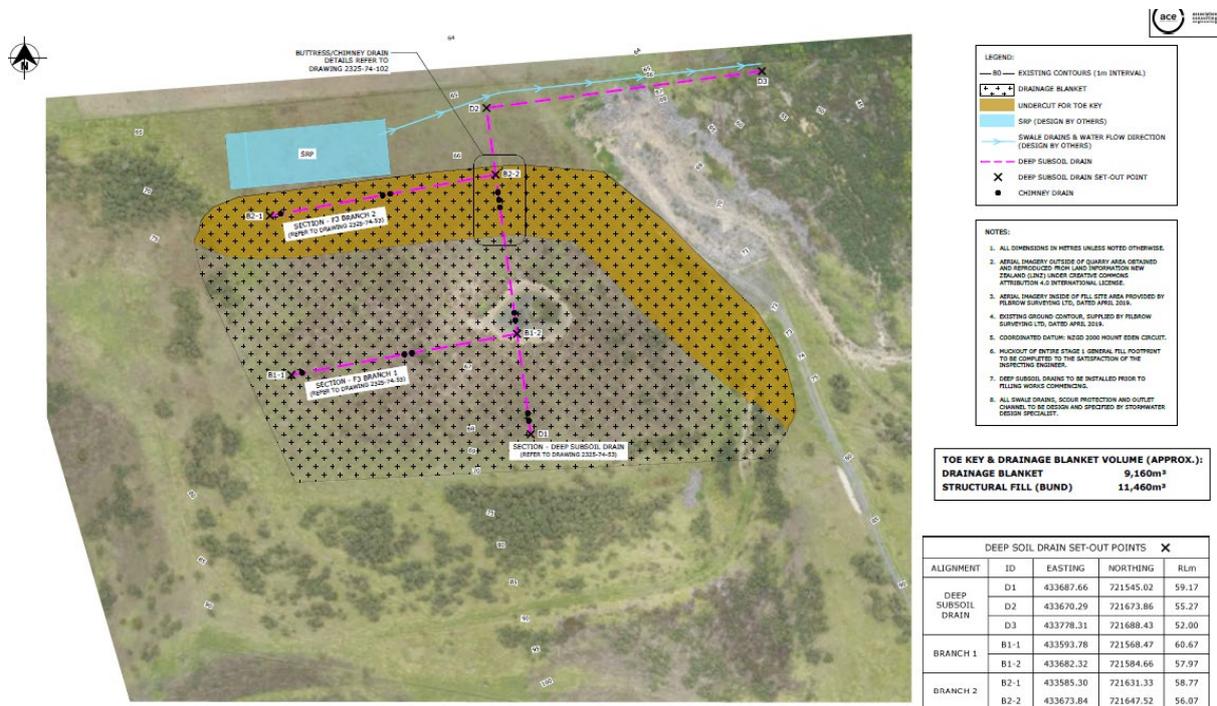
Drawing 2325-74-09 Rev A 'Toe Key Area, Basal and Underfill Drainage Plan' Source: Gaia Report on FA3 (Appendix 8)
